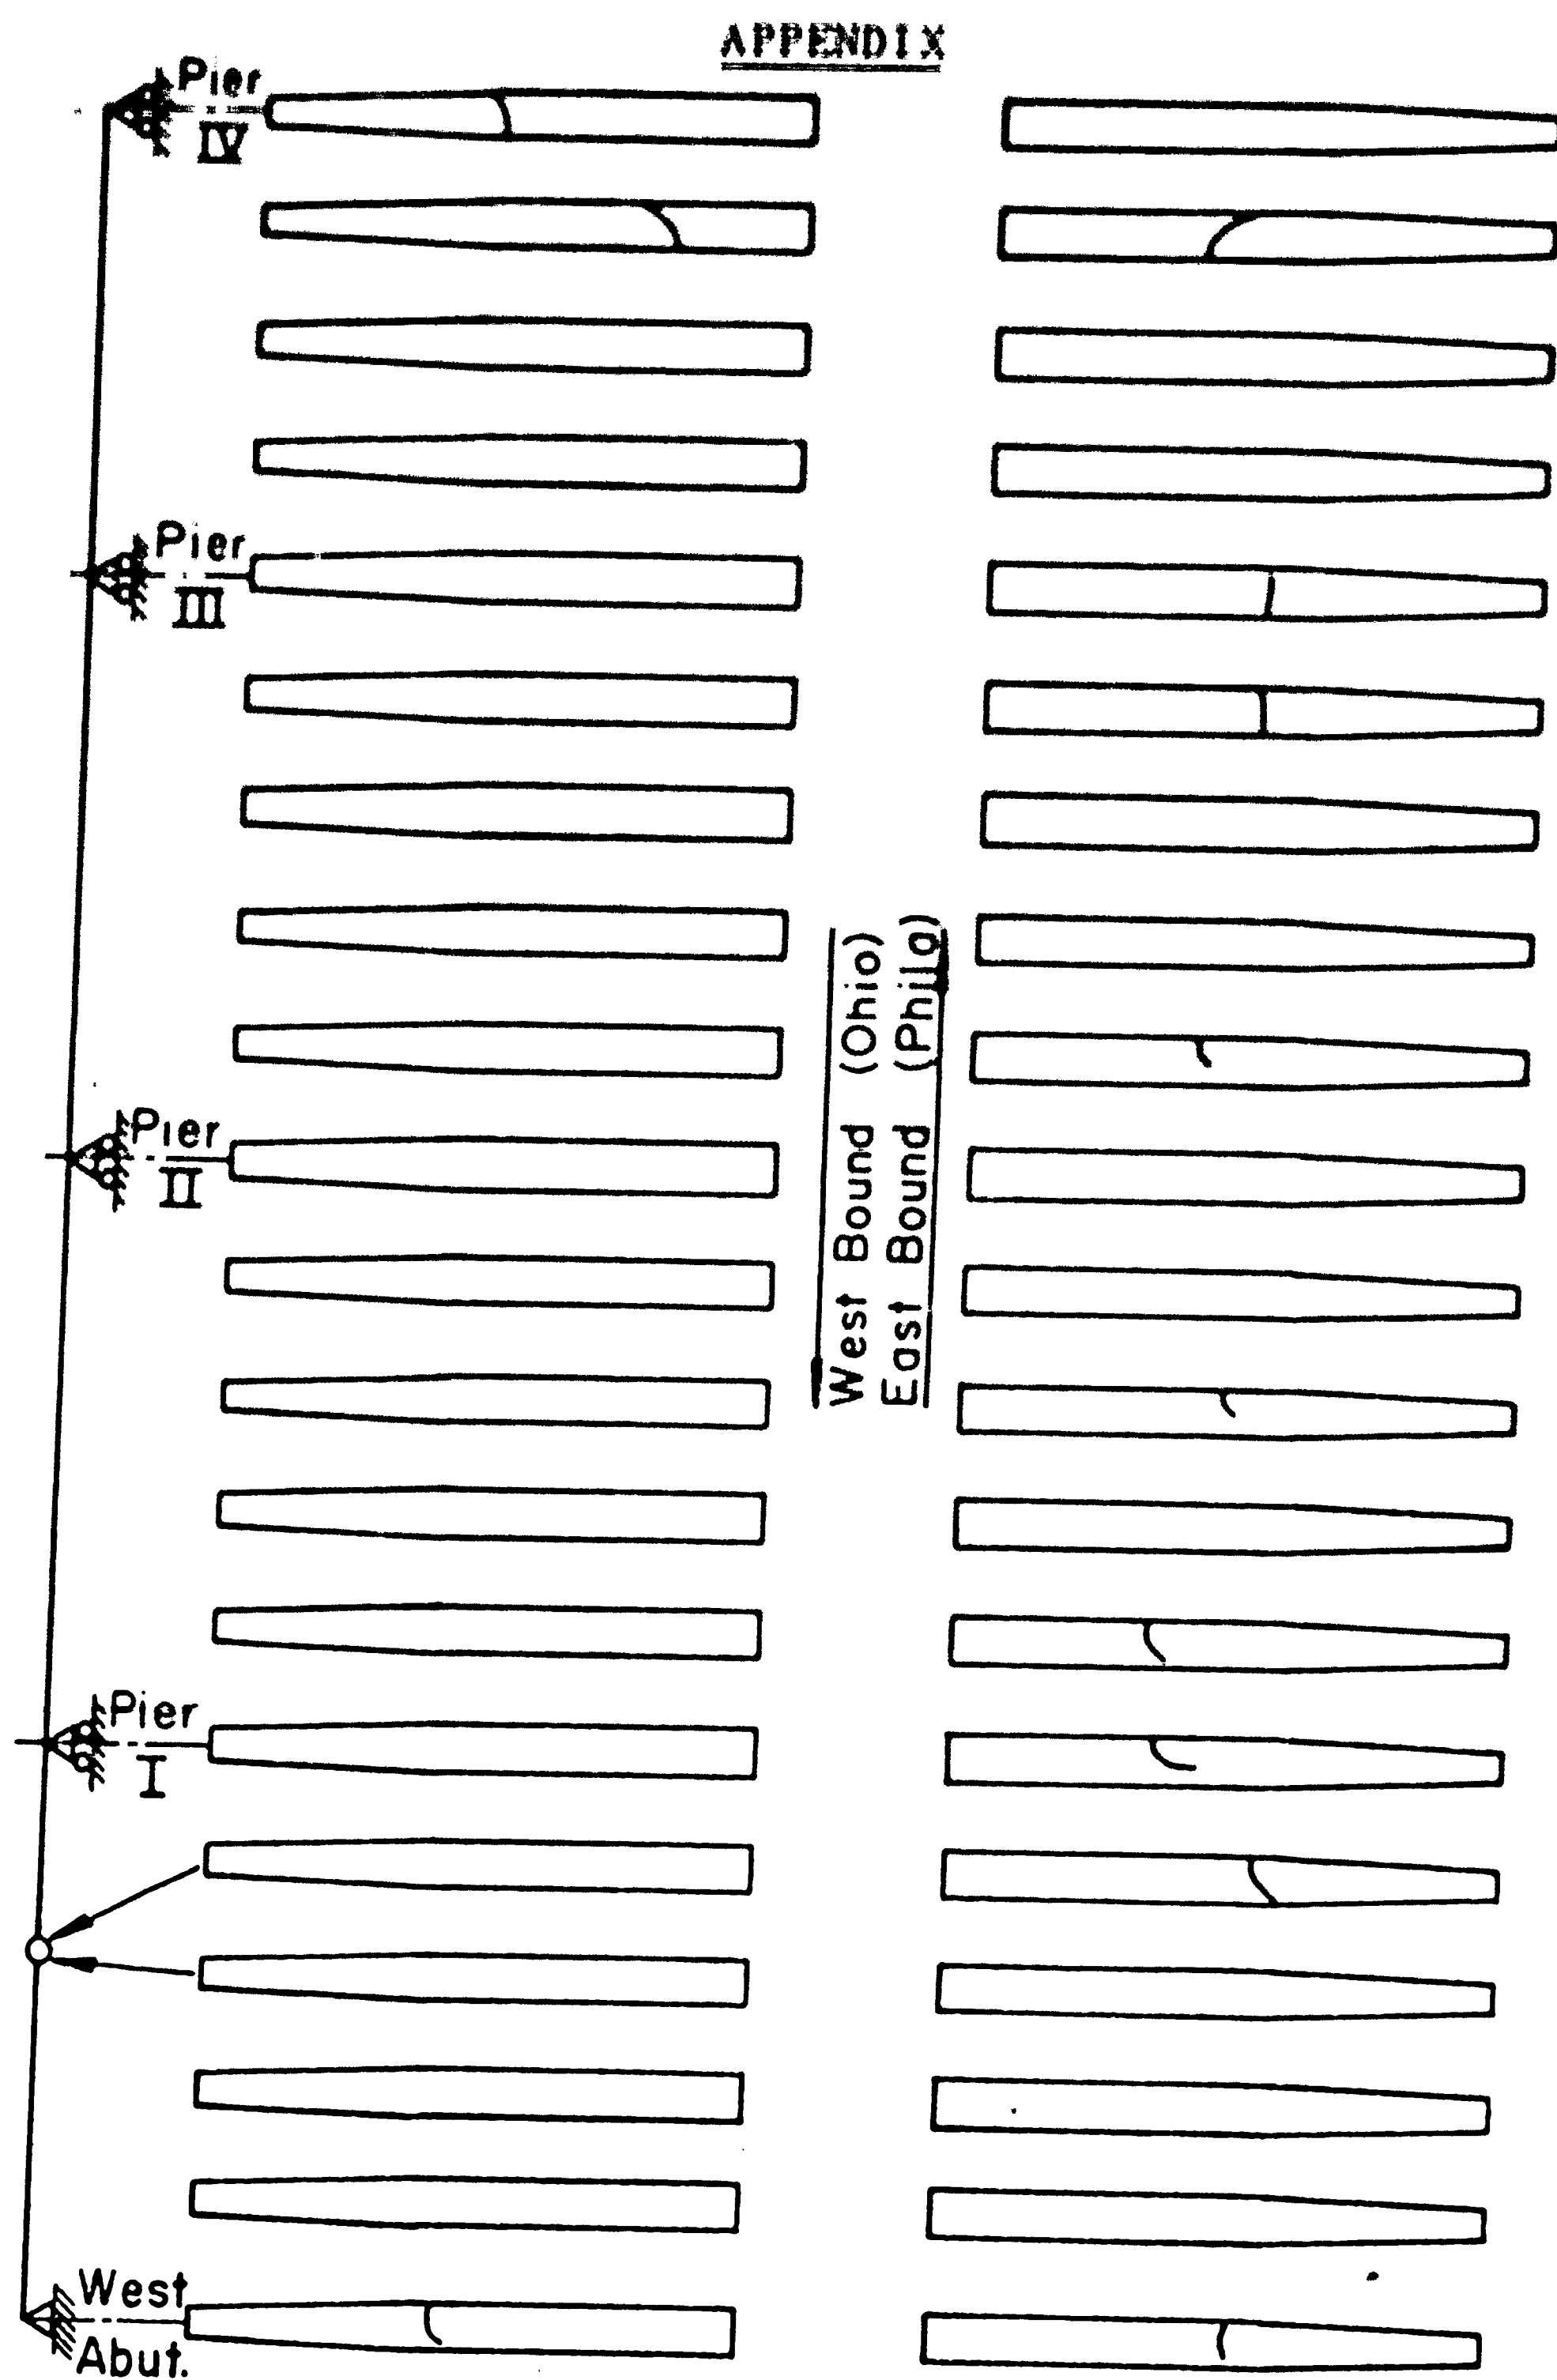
Cracks in Tie Plates, Allegheny River Bridge
